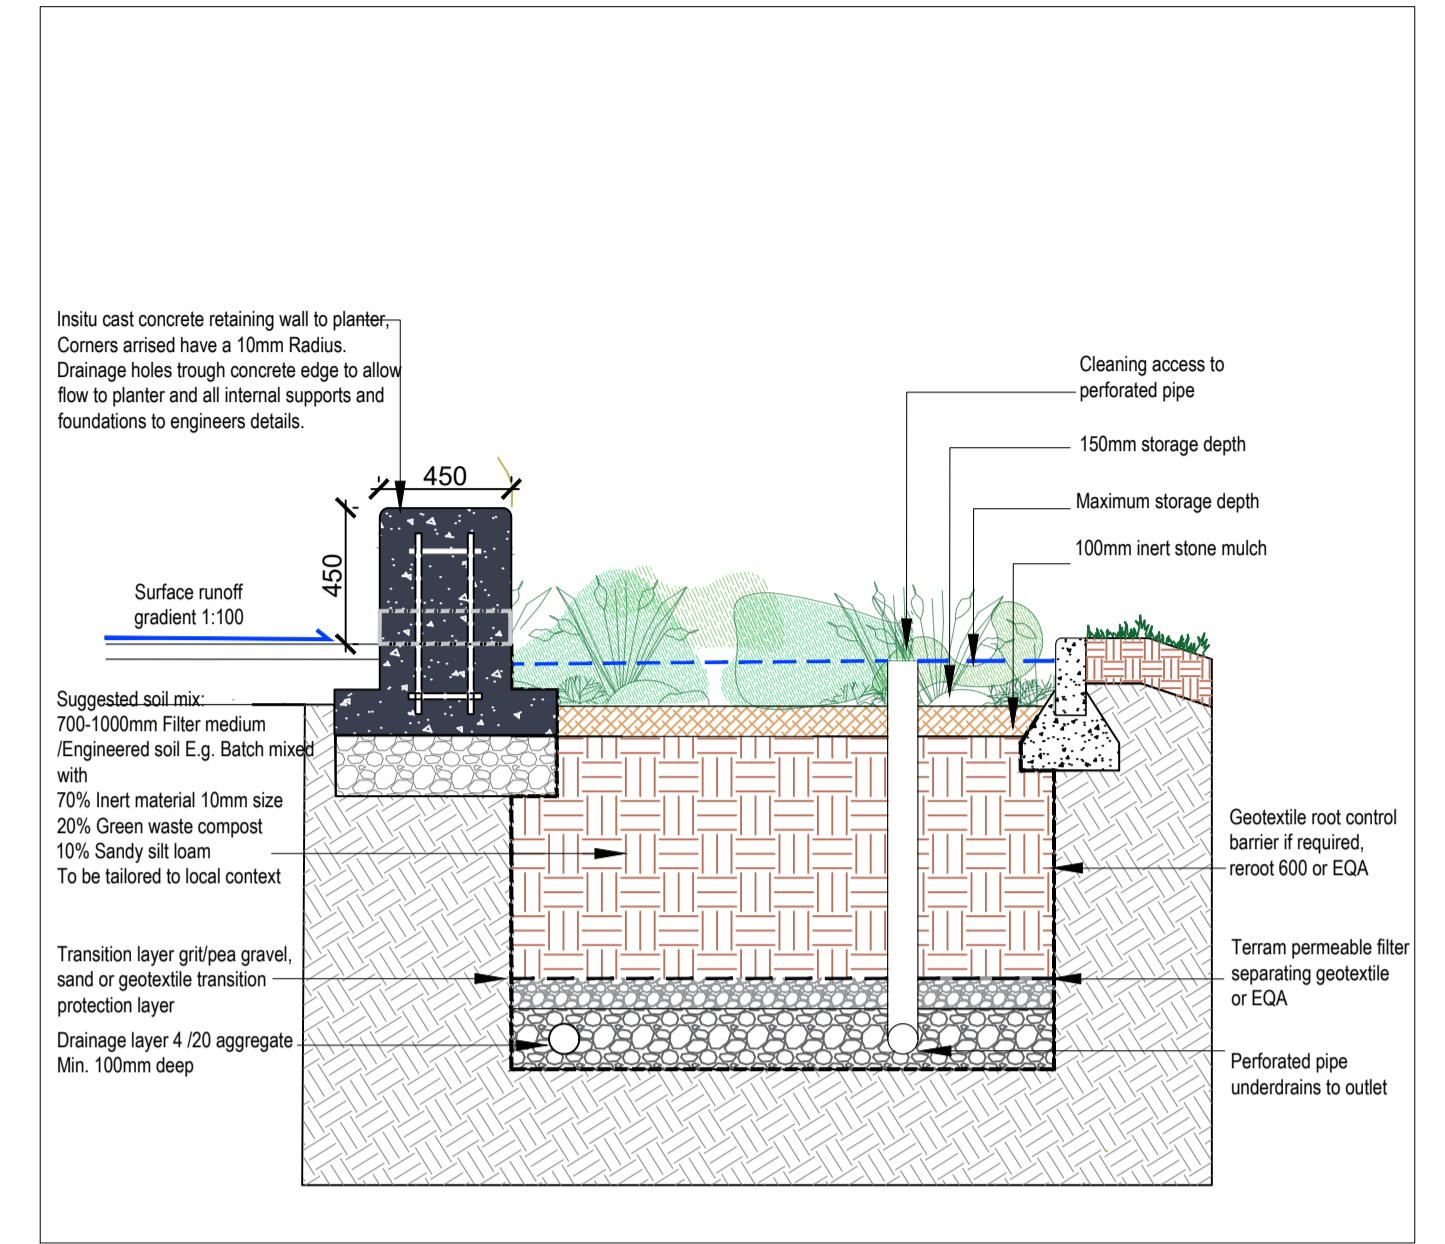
Entrance Planter with concrete seating edge. Scale 1:25@A1
